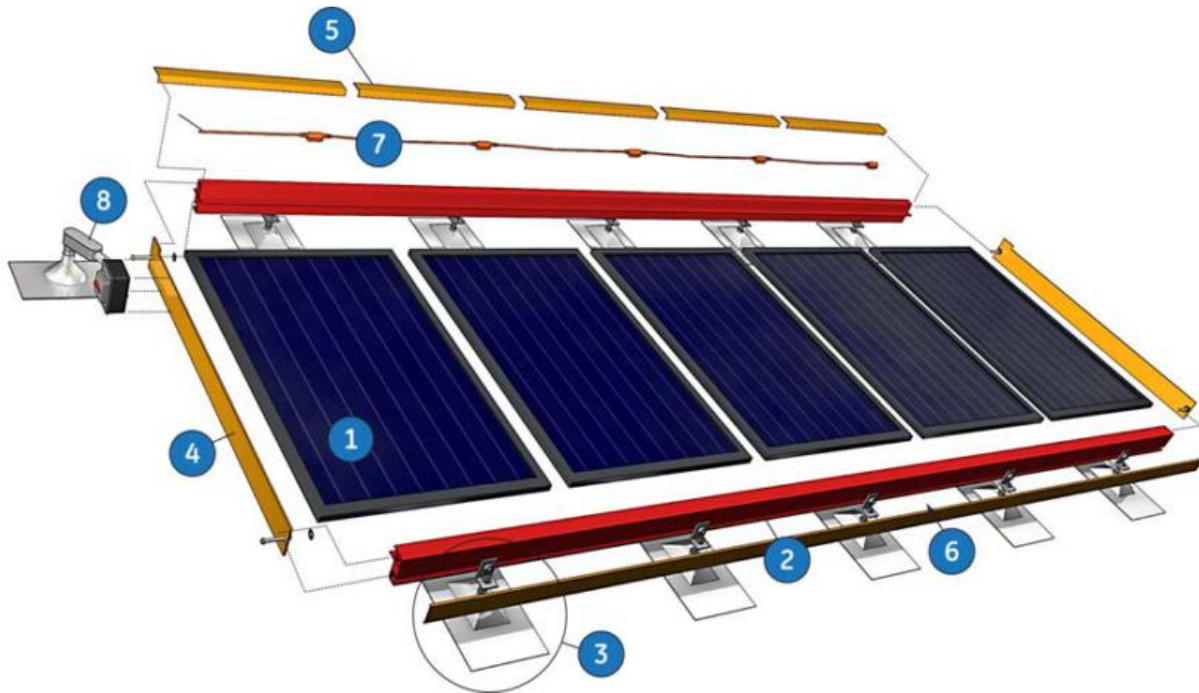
Exploded view of the insert and capture/plug-and-play mounting system.
